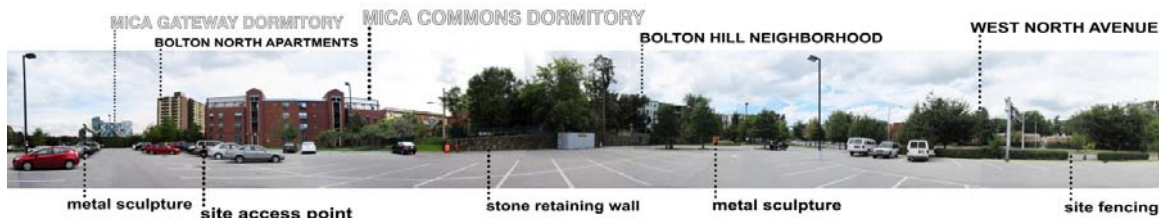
Site Panorama showing adjacent buildings, neighborhoods, and site conditions
